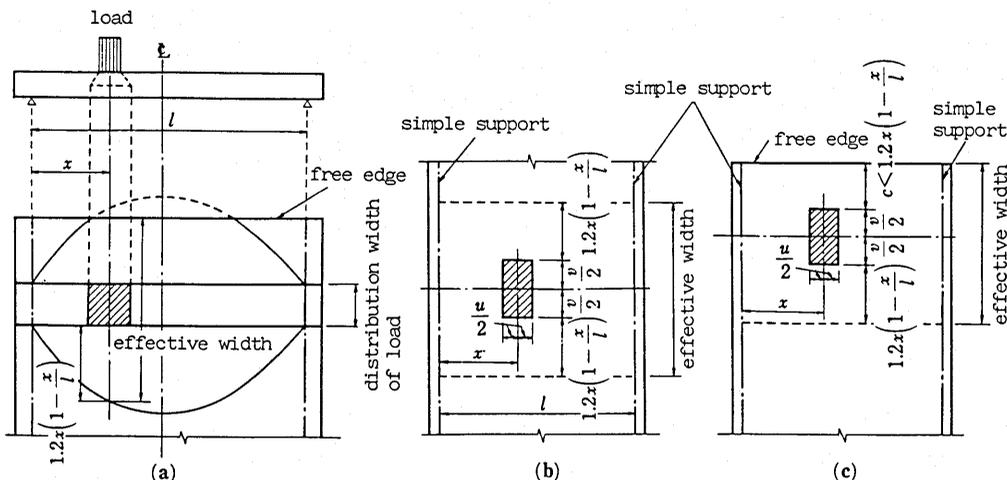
Effective width of prestressed concrete panel composite slab
